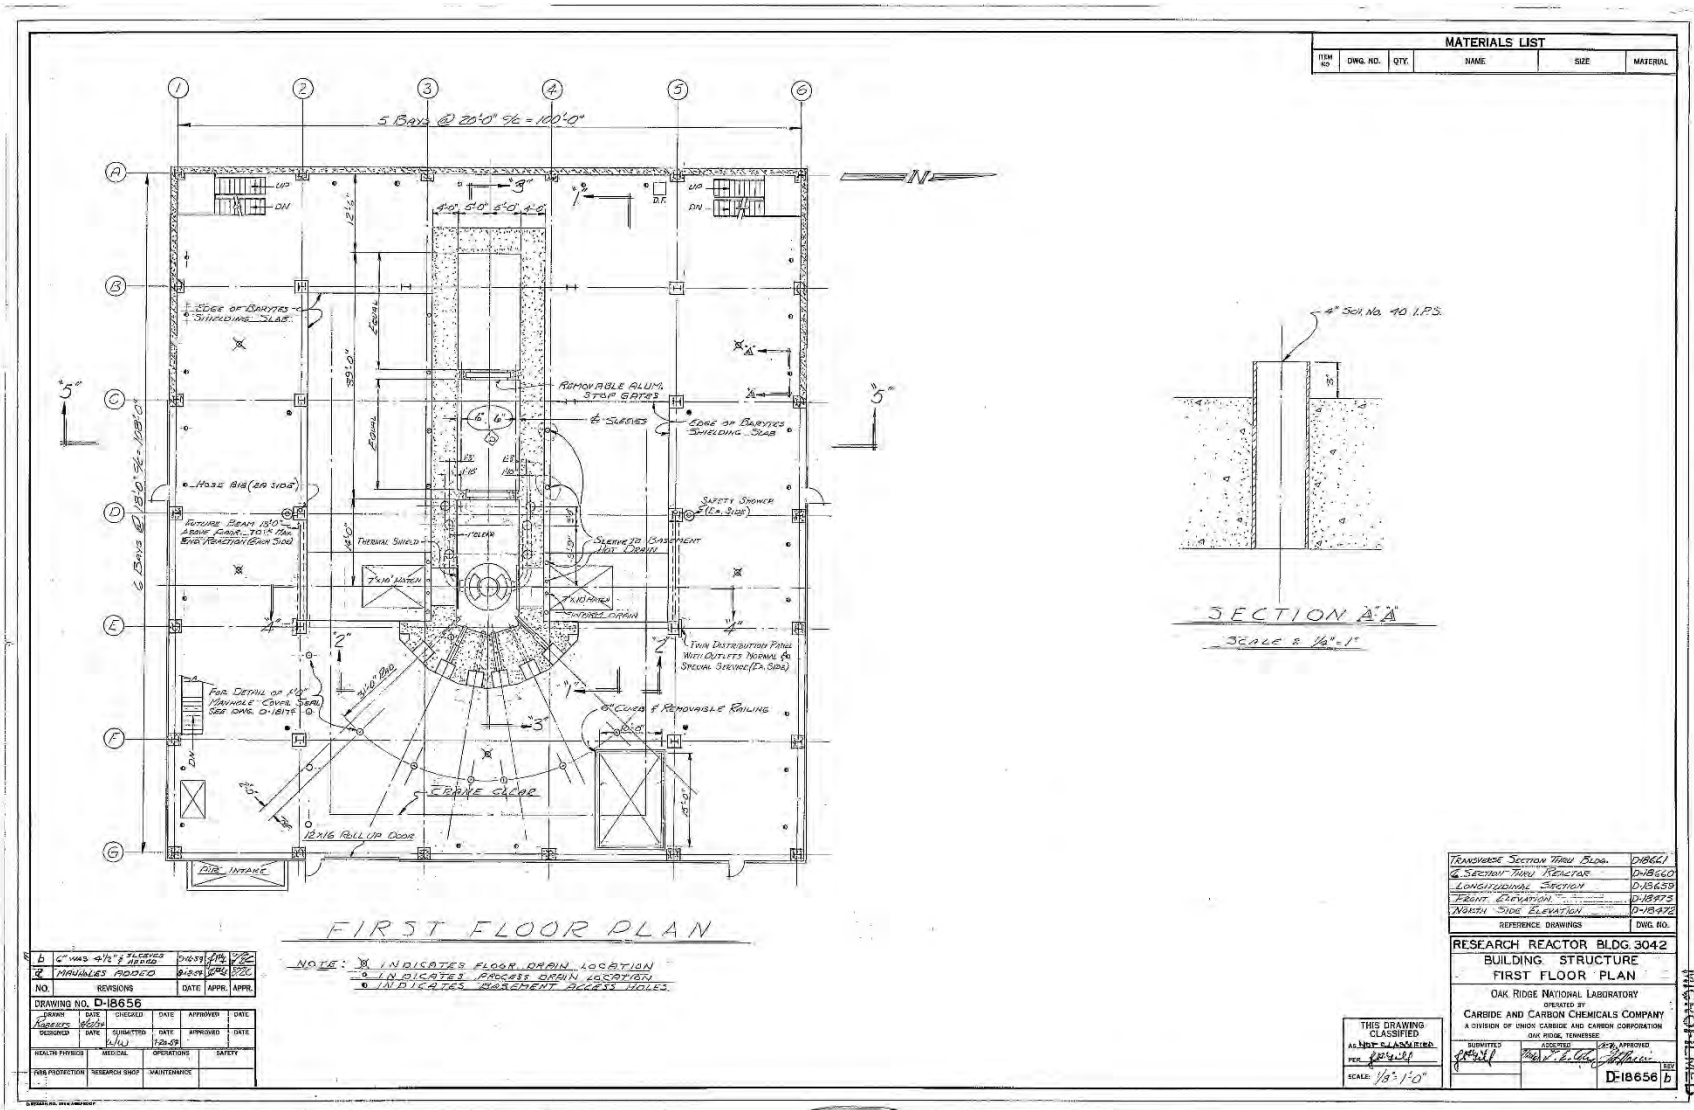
First floor plan for Building 3042, including sections (Oak Ridge National Laboratory, April 27, 1954).
